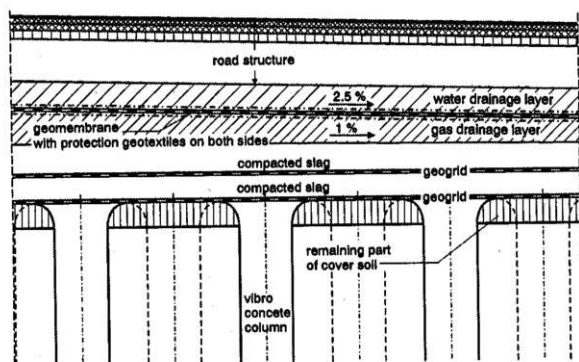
Cross-section of reinforced roadway used to carry heavy traffic over a landfill near Hanover, Germany.
